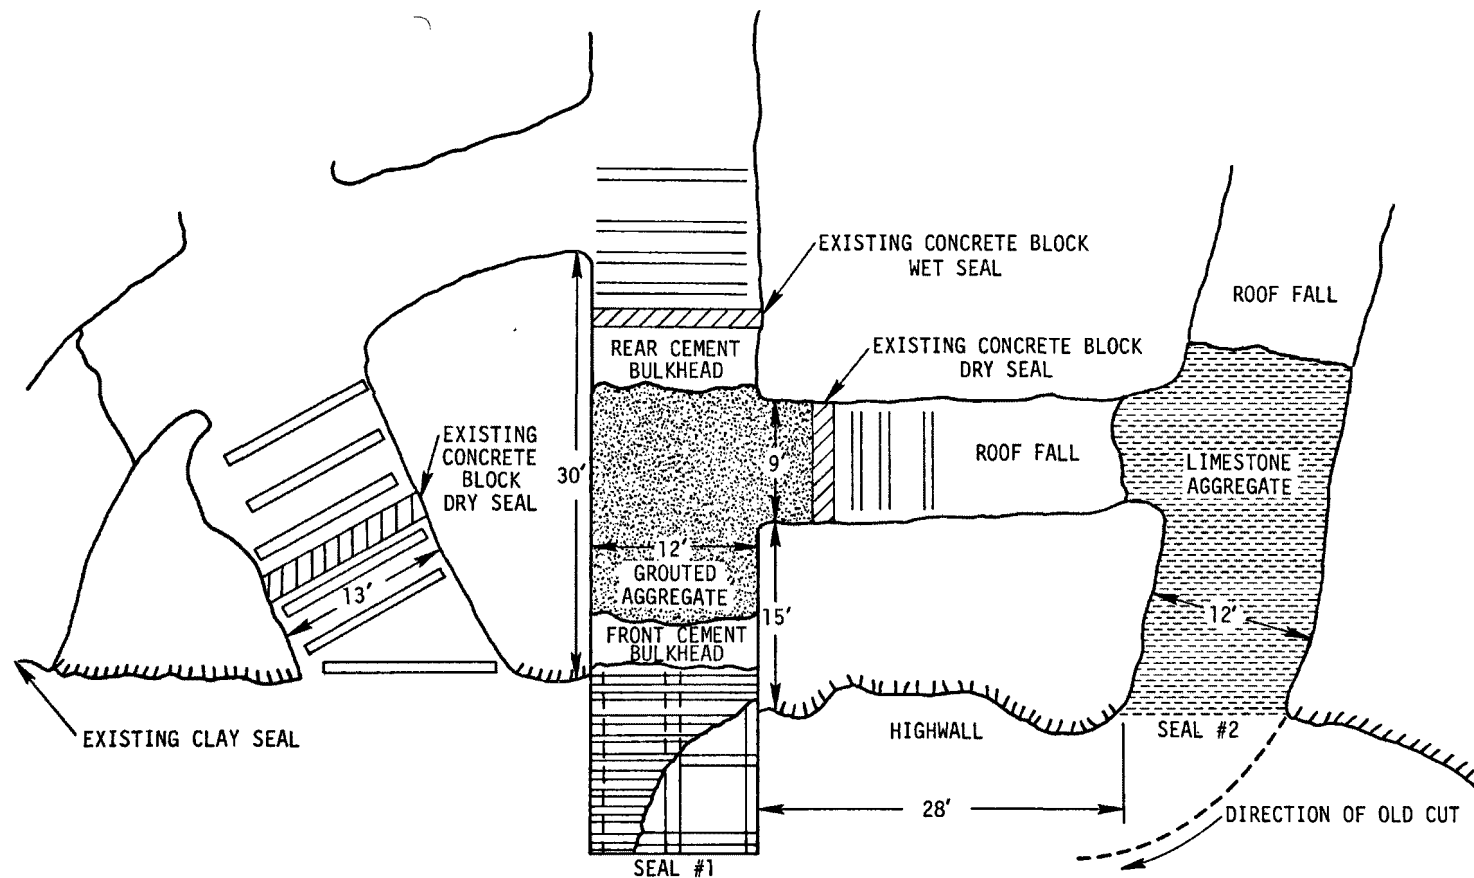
Plan view of remedial construction - mine No. RT5-2.^a
